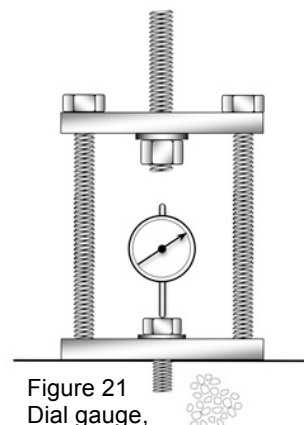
Dial gauge, remotely mounted, set within pulling frame, bearing on anchor bolt head.
